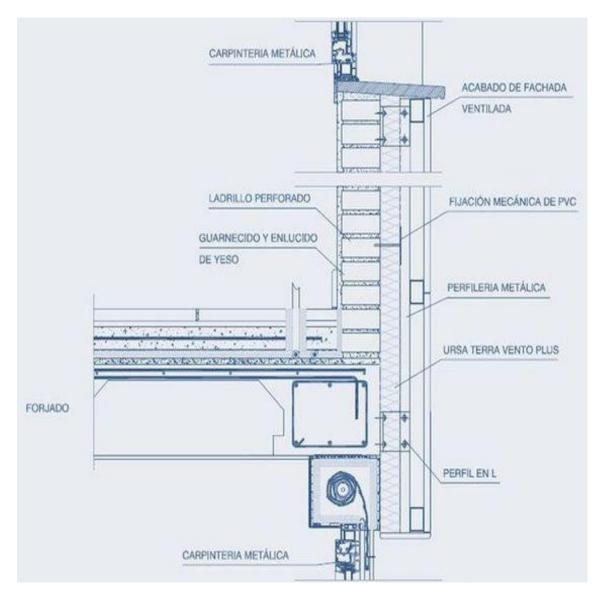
Example of construction detail. Tradicional ventilated façade (S01).
